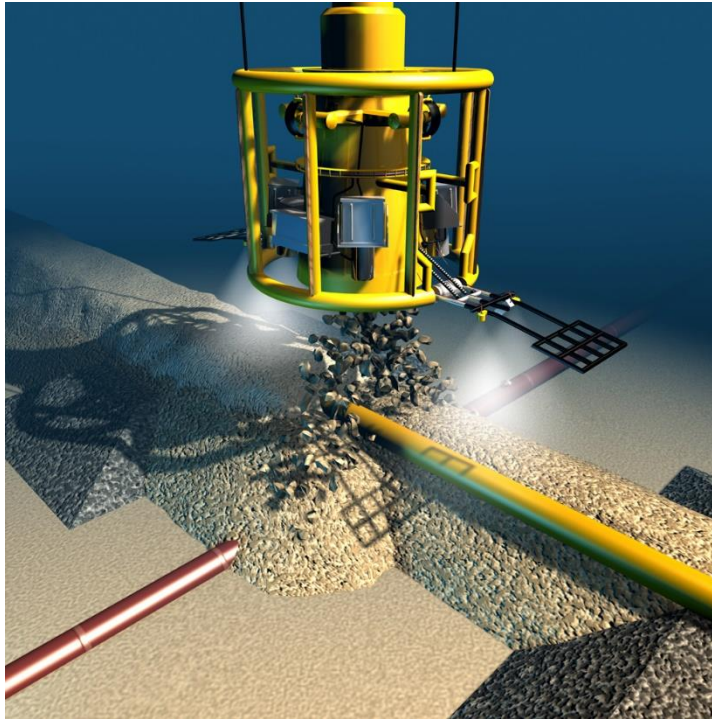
Example of cable crossing rock berm installation (Courtesy of DEME Offshore).
